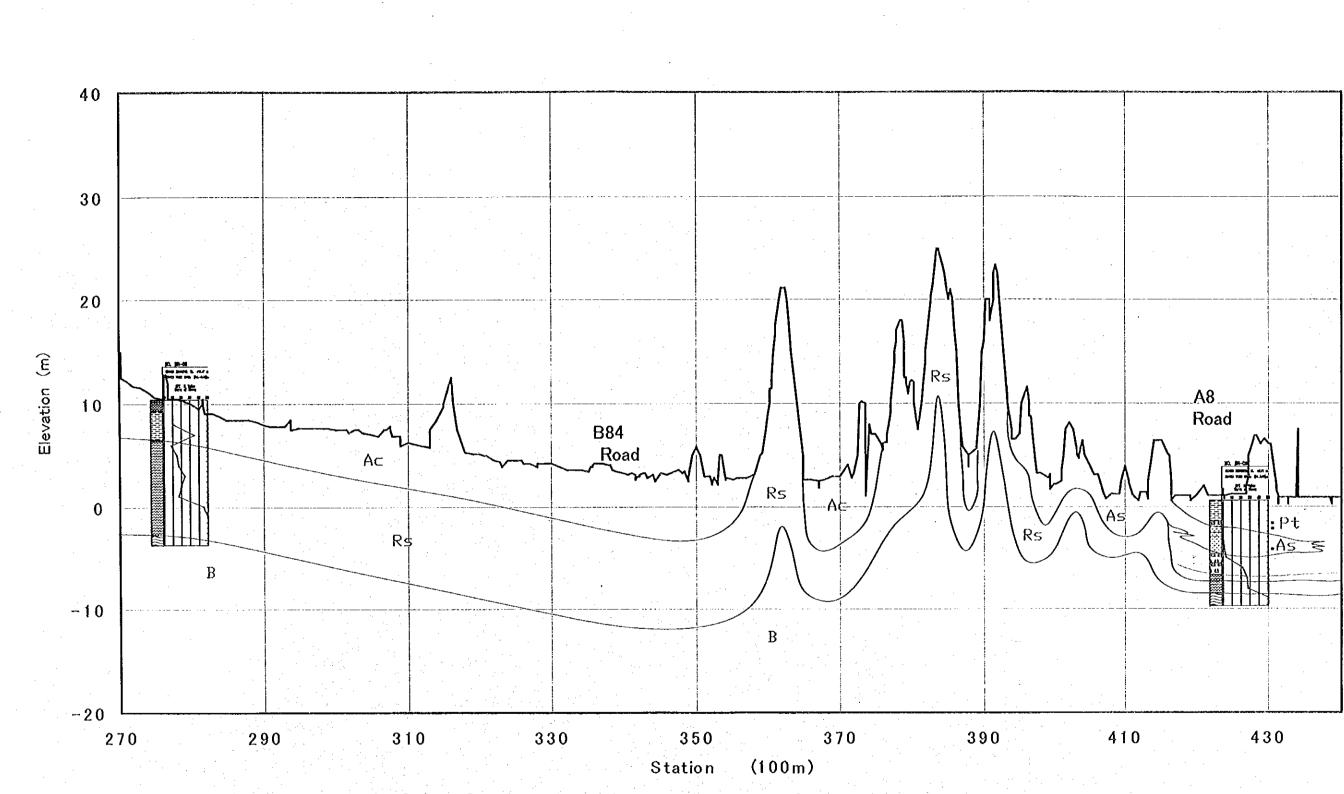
Geological cross section (Provisional) (Section : A4 Road to Southern connection)
